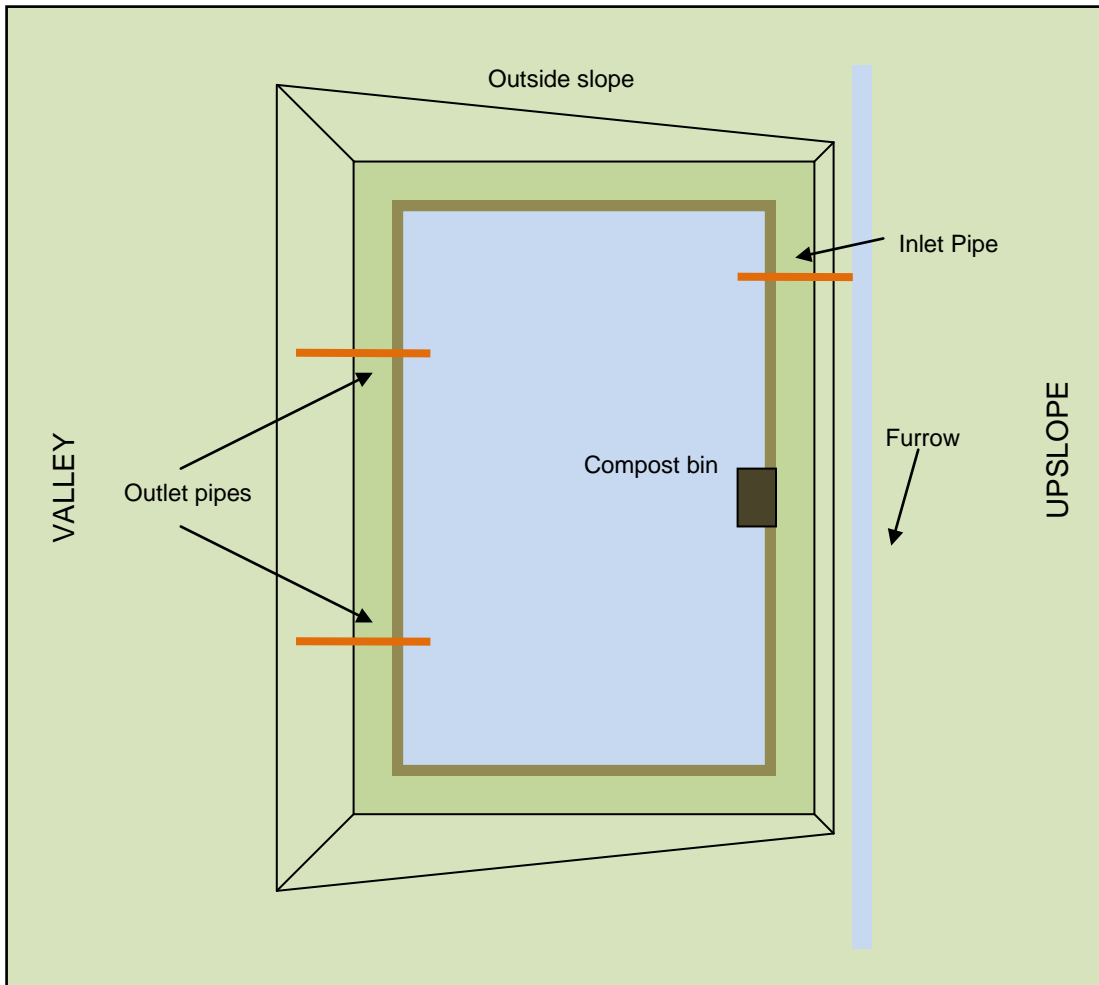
Plan view of a Rural Aquaculture Promotion (RAP) standard pond showing typical layout of inlets, outlets, furrow, compost bin, and overall orientation in the valley
